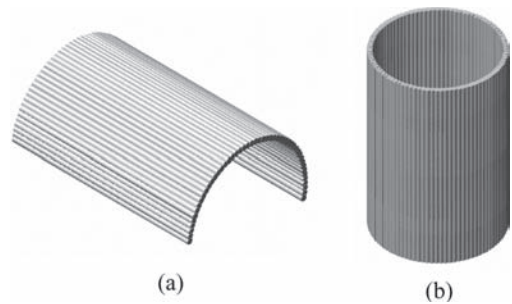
Typical jet-grouted supporting structures for tunnels (a) and shafts (b).
